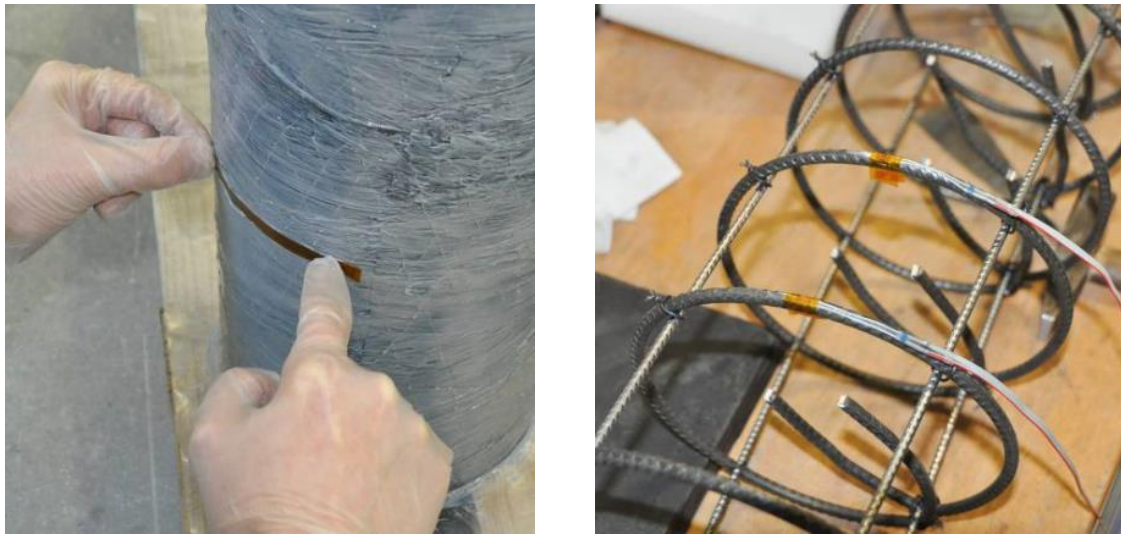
Preparation of the test specimens and application of the CFRP jacket.
